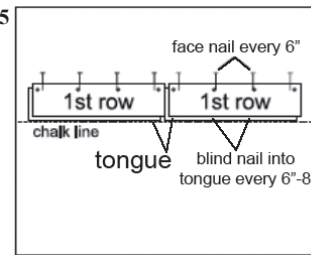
Installing the first rows. Select very straight boards to use in the first rows. The groove side should be facing the wall. At least the first two rows will have to be face & blind nailed as there will not be enough clearance to use the flooring nailer. At the end of the first row, put a $\frac{3}{4}$ " spacer along the wall, measure the length of the last plank to fit and cut.
